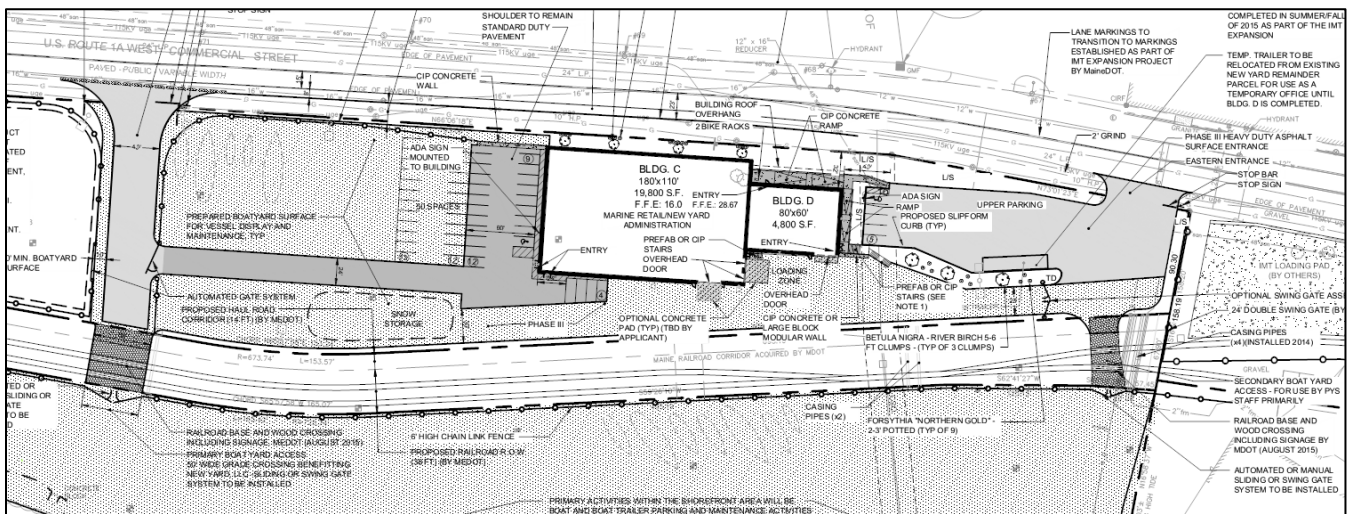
Proposed site plan, encompassing Bldgs C and D. Driveways are located to access rail crossing points and areas in light grey are 'prepared surfaces' for boat storage
